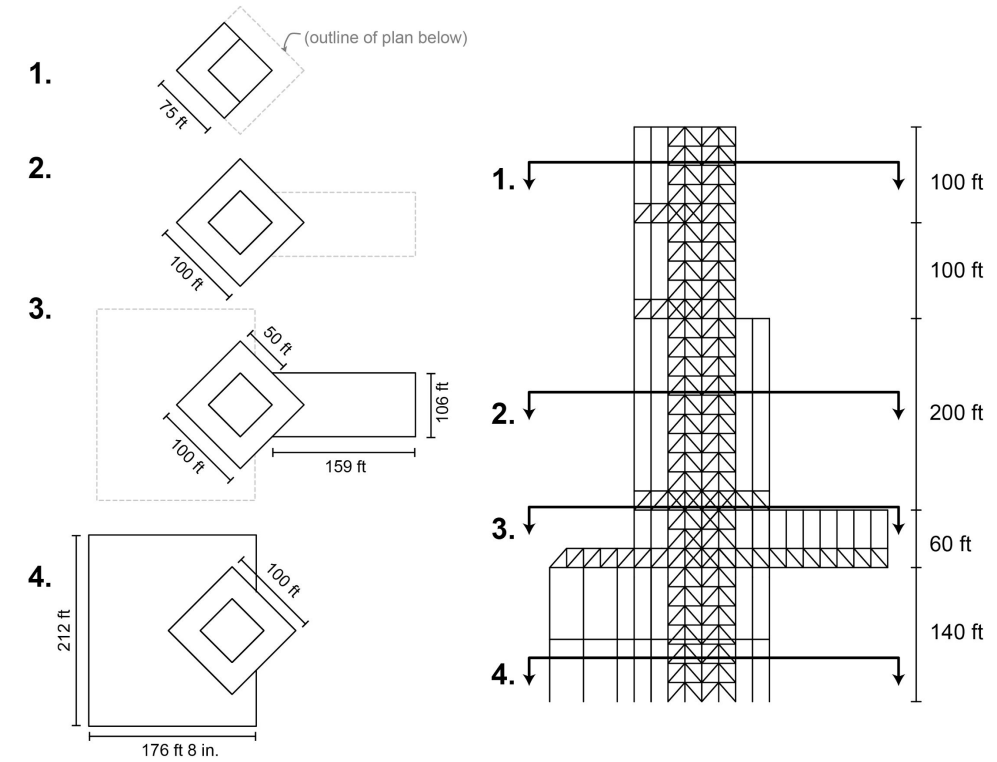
North-facing elevation (right) with corresponding plans (left).
